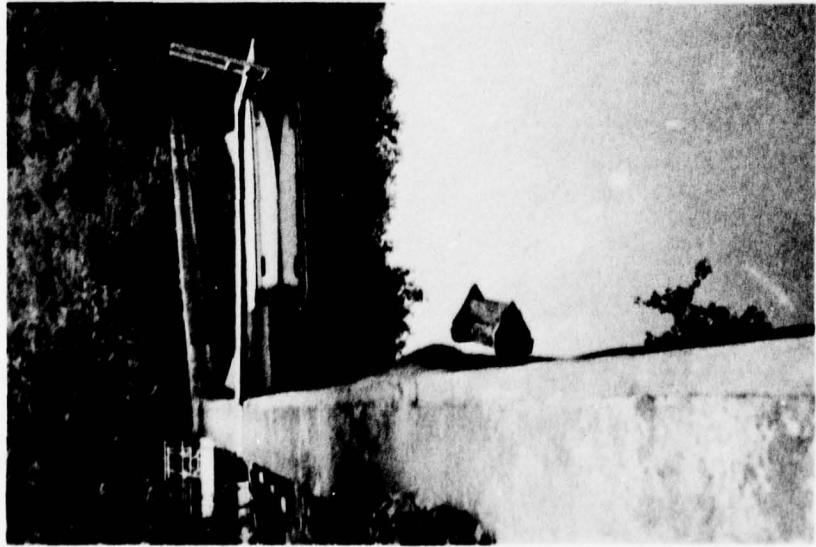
View of dam crest from left abutment showing repair slab on upstream.
